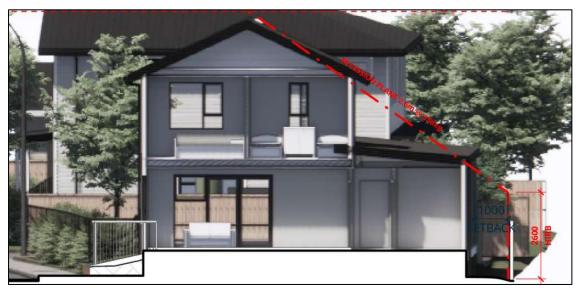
Image Depicting Extent of Recession Plane Breach for Unit 24 (Source: Appendix 3).
